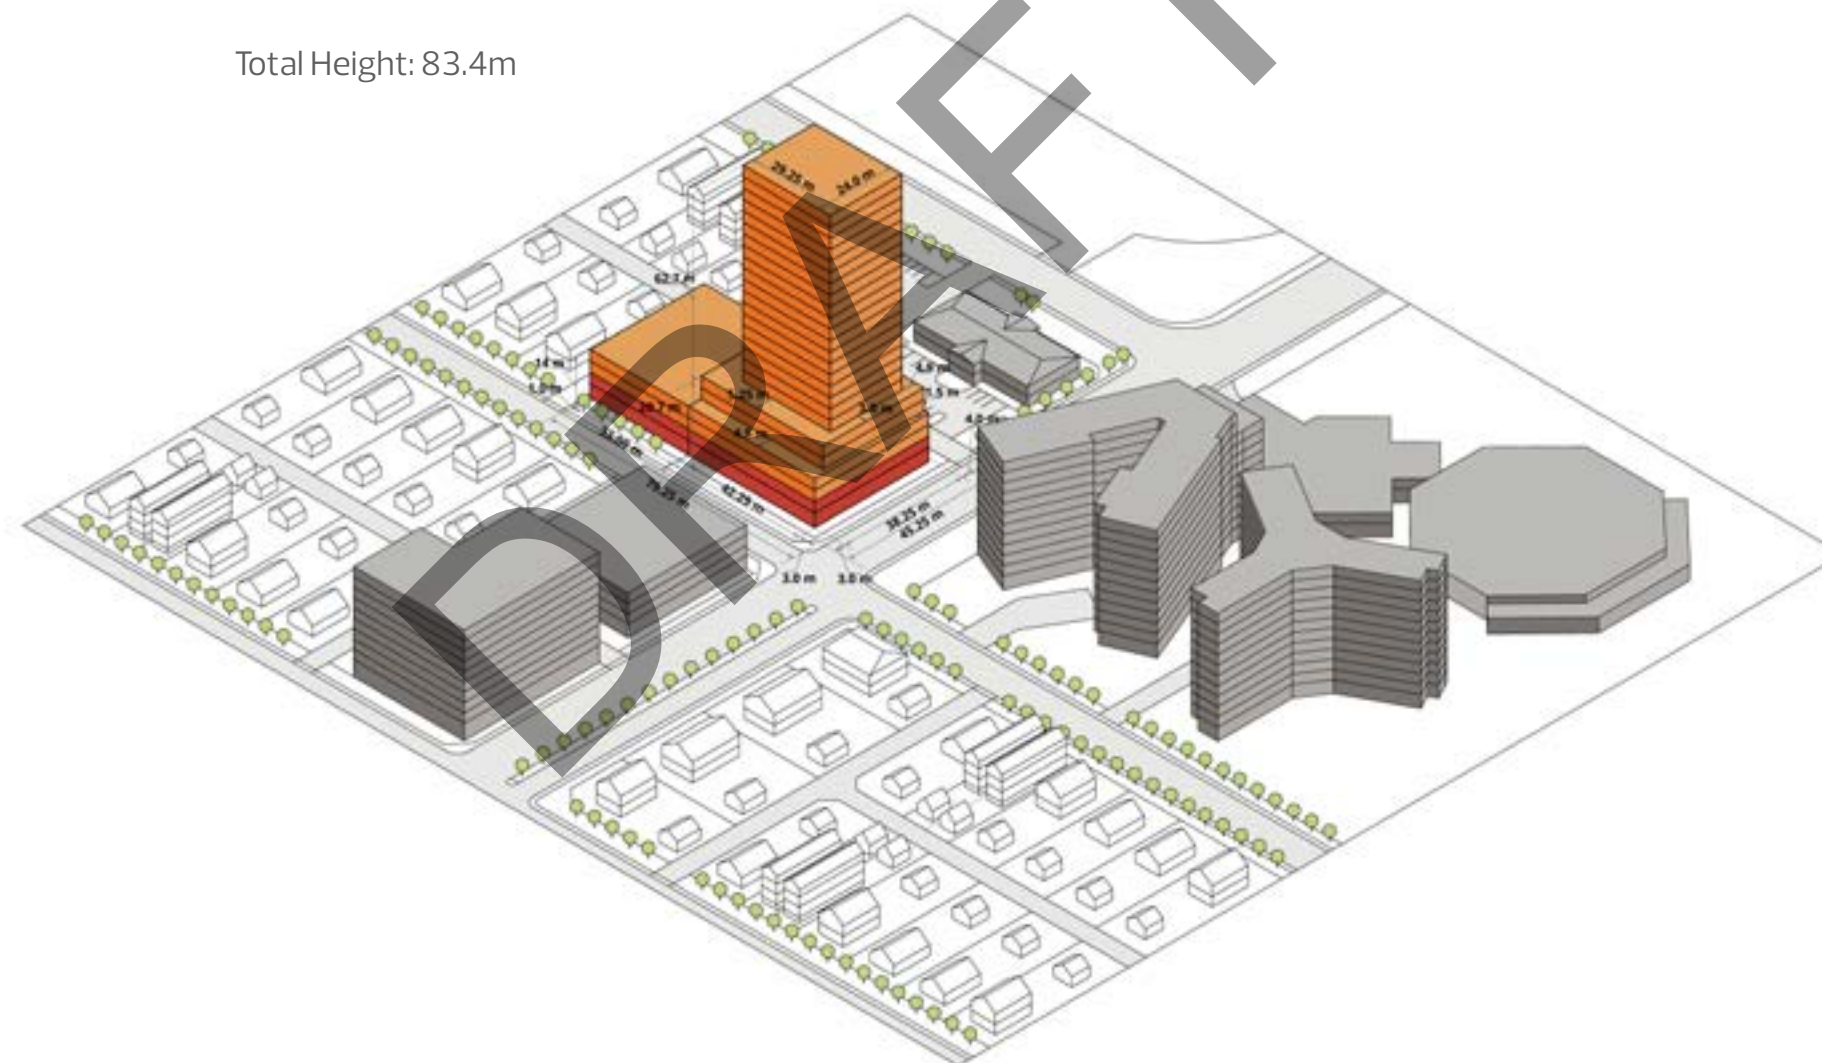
Concept Massing Model – 25 Storey Building (6 Storey Podium)
